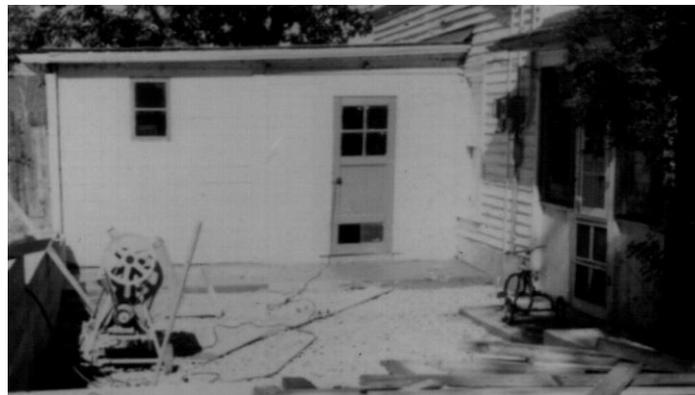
Garage after conversion to studio but before stone cladding, 1103 6th St., date unknown
